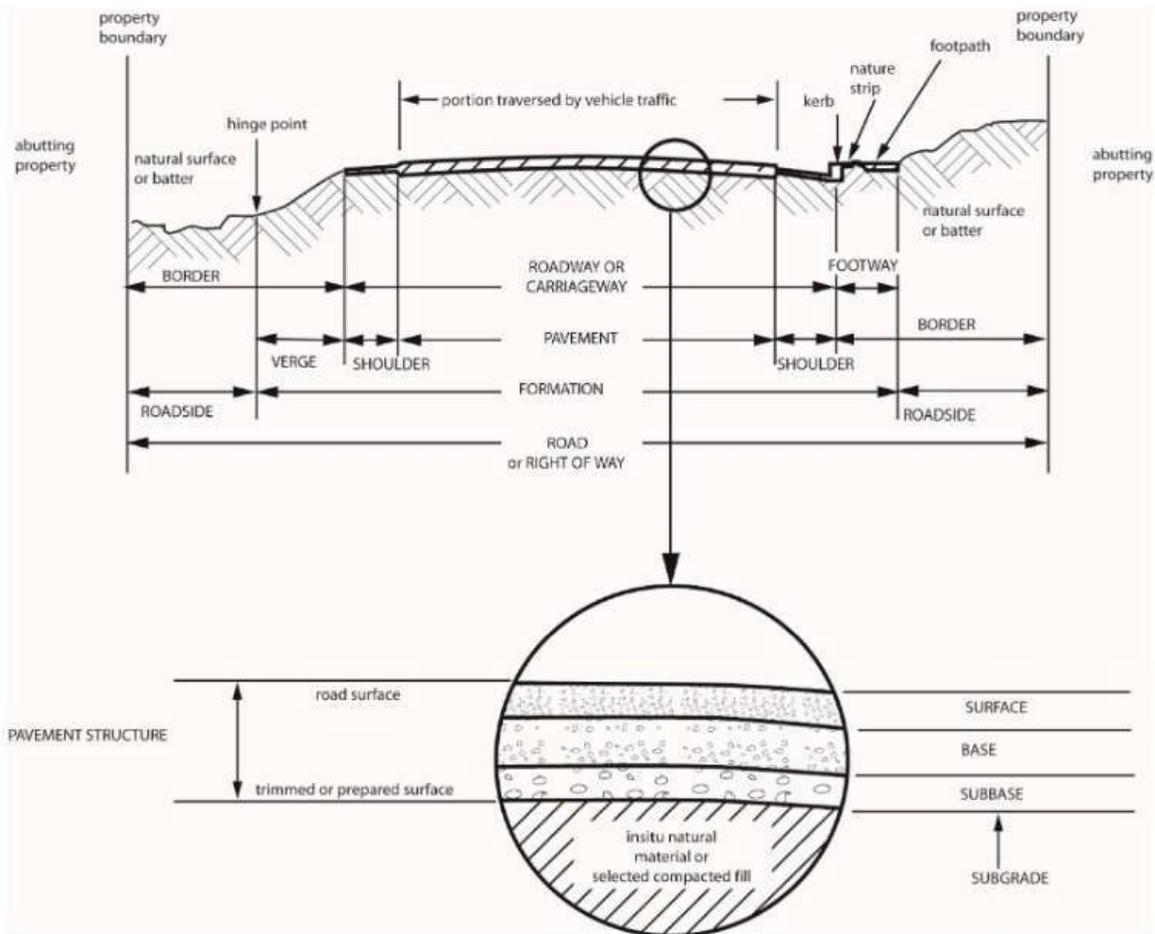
Typical Road Pavement Structure (Source: Austroads 2023)
